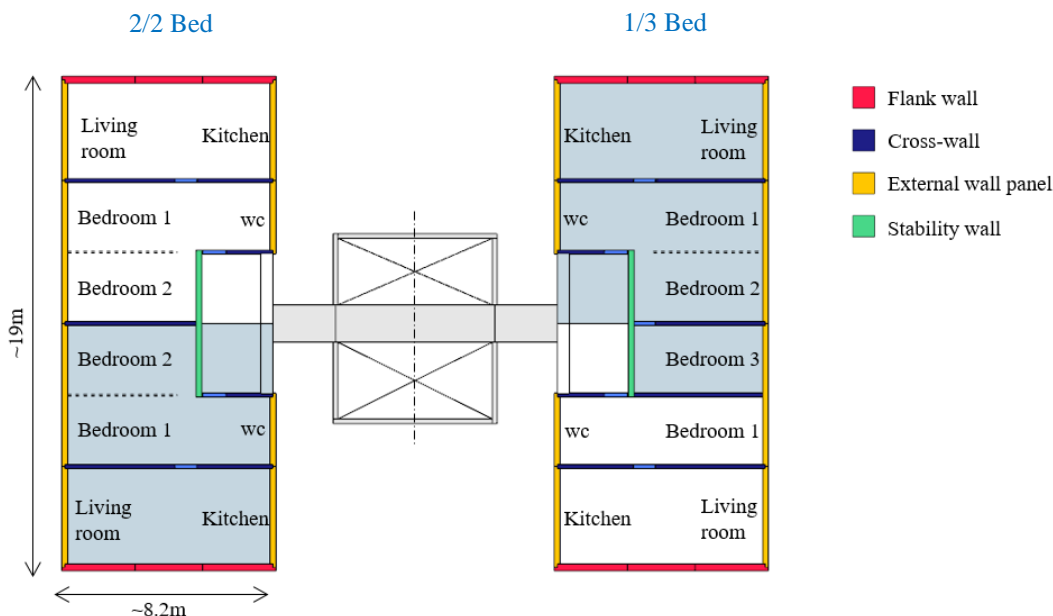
Approximate floorplan of the Ledbury Estate tower blocks. For illustrative purposes a one and three bedroom flat layout is shown on the same floor as a two-bedroom. Some partition walls have been omitted for clarity.
